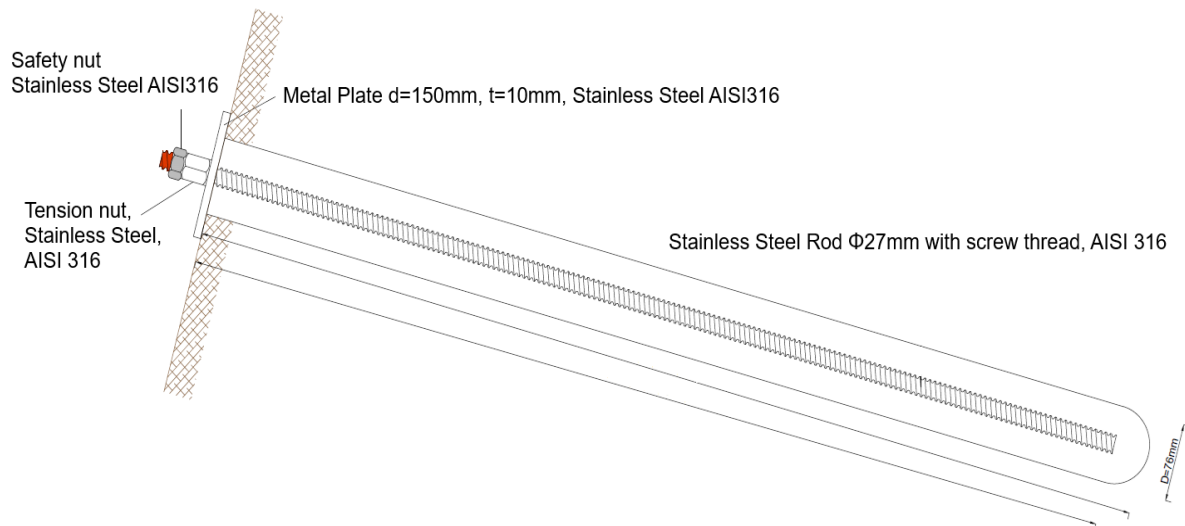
Typical passive anchor arrangement and installation detail for Dikteon Cave.
